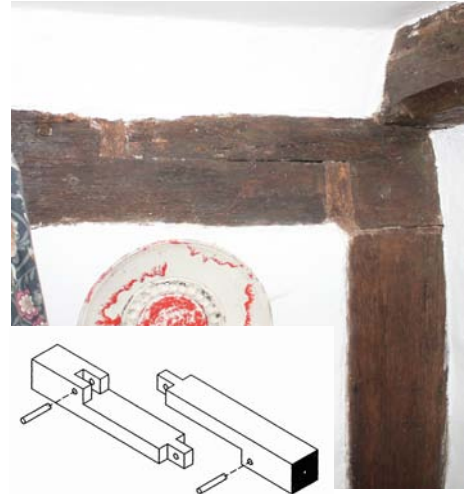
Edge halved & bridled scarf joint in hall chamber's front wall against post C
